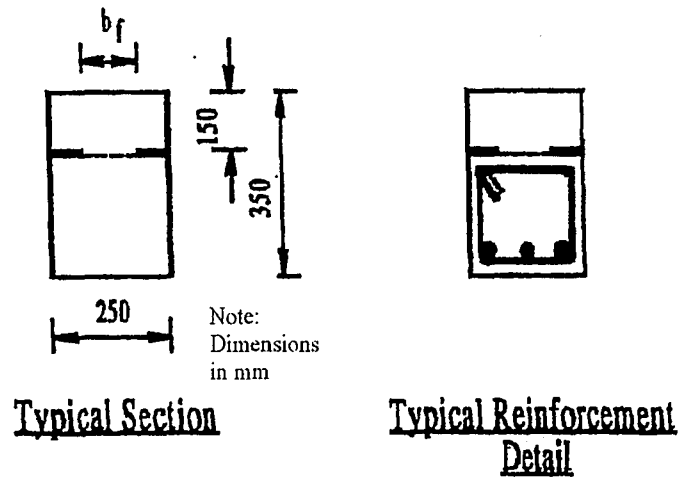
Cross-Section of Beams Tested by Patnaik
